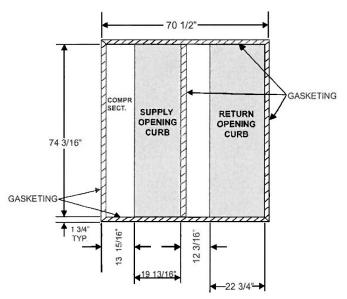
Plan View of Existing Curb Used with CRADCURB004A00
